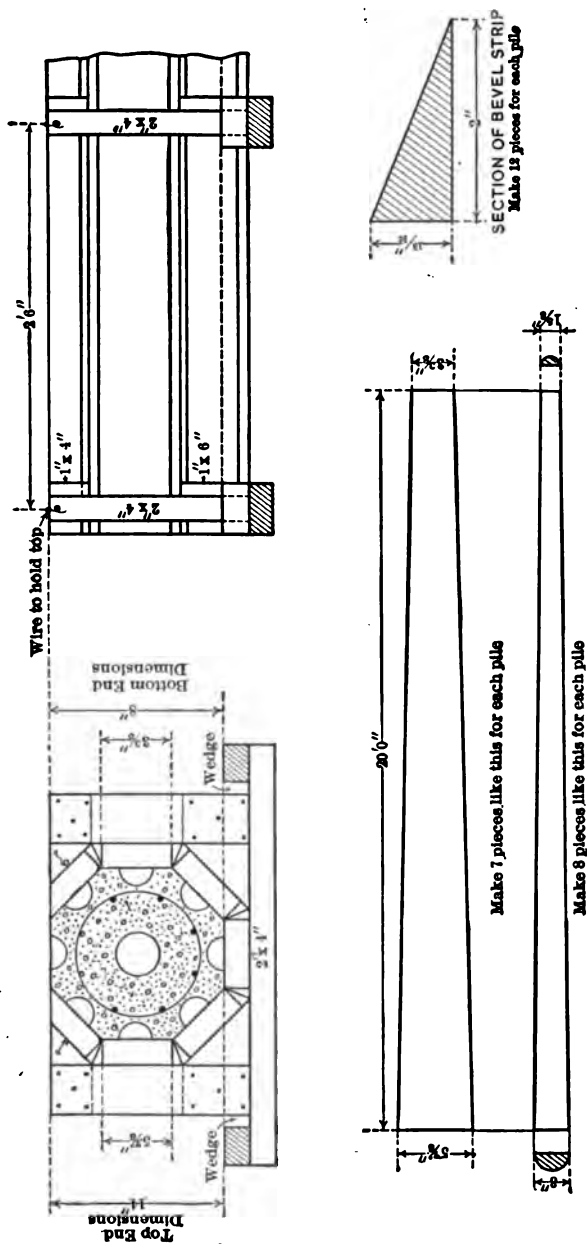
CORRUGATED CONCRETE PILE FORMS.
